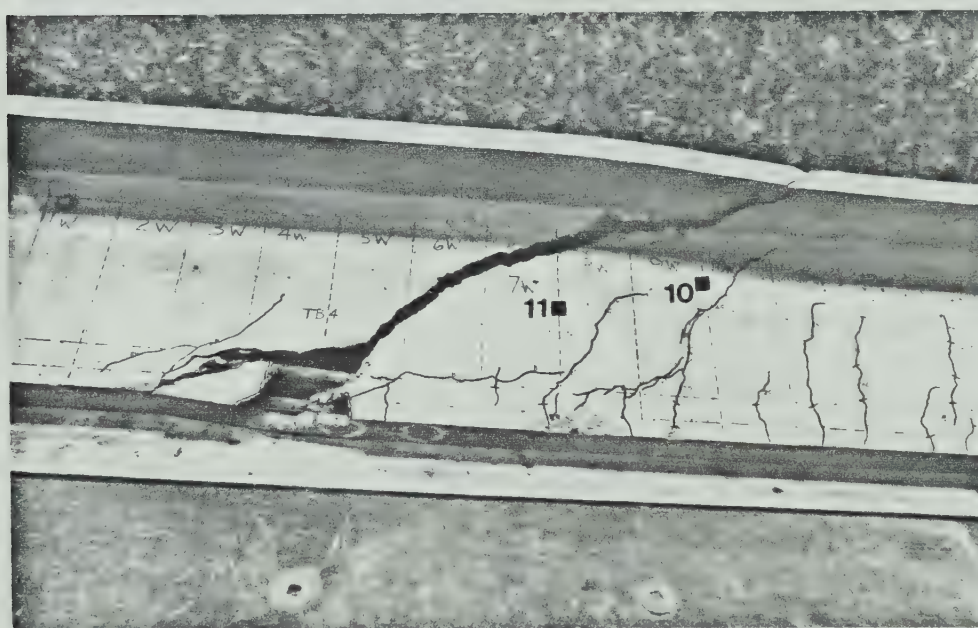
Cracking in west shear span of TB 4 after testing with strain gauge locations shown
